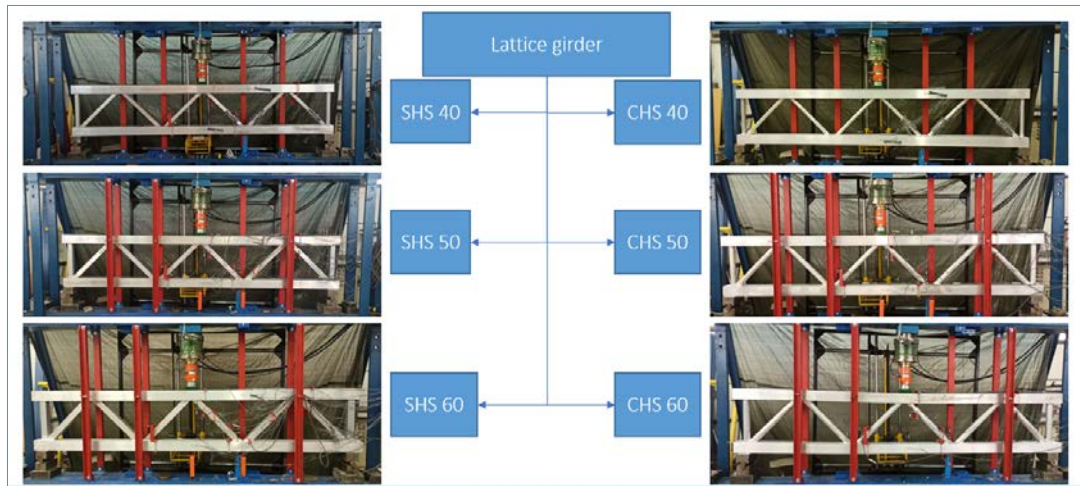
Welded aluminum lattice girders- specimens
